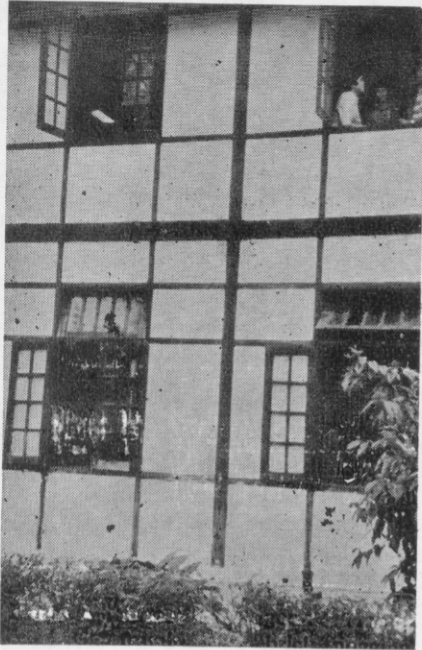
School in Rangoon. Timber framig with brick nogging on diagonals, good quality construction
